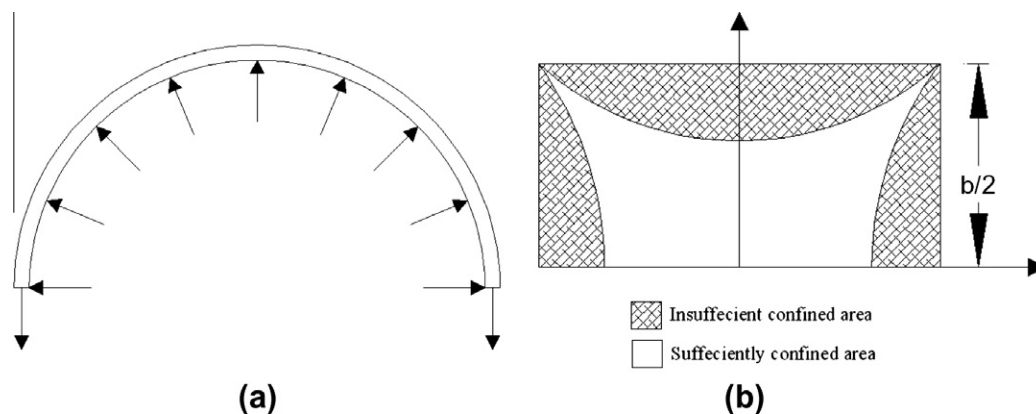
Confinement of jacketed column, (a) circular jacketing, and (b) square jacketing (Teng et al. [23]).
